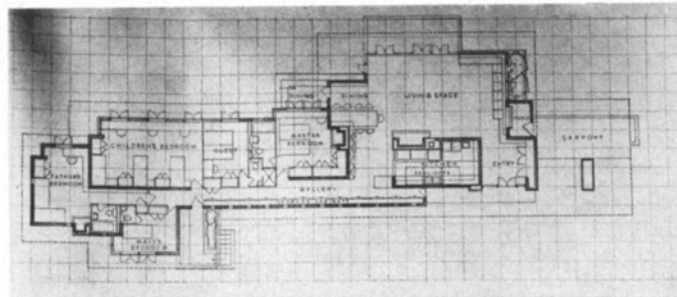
Eric Brown house, Kalamazoo, Michigan, 1951. Floor plan. (From *House and Home*, March 1953.)
